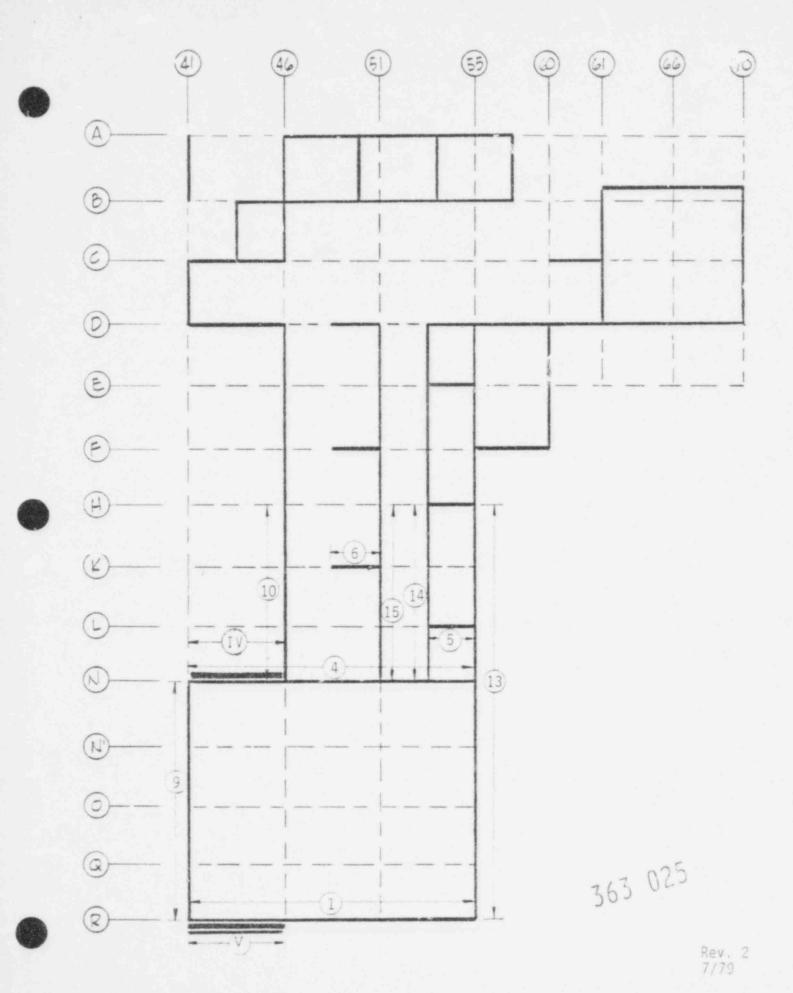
Wall Key Plan For Elevation 77-93
